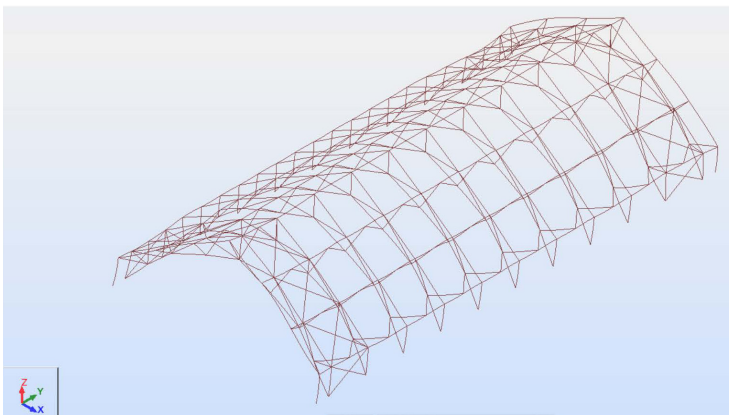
Perspective view of the deformed structure under the wind load applied on the gables
